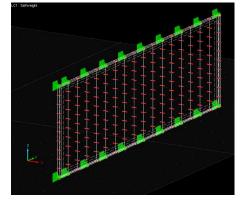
TES panel - 40 cm mullions spacing, 10 wall anchors, 12 screws per mullion.
